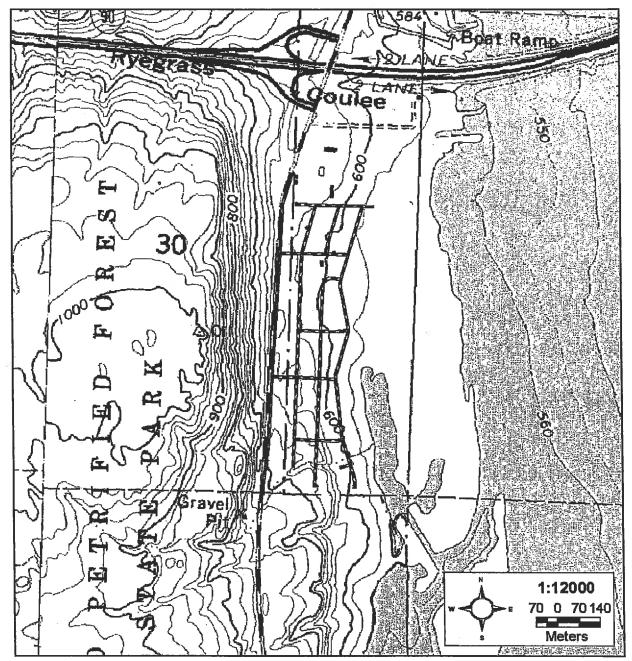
Proposed access road centerlines depicted on Vantage 7.5' quadrangle.
